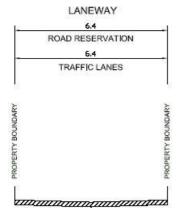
(f) Port Sorell and Environs Street Cross-section designs - Laneway
